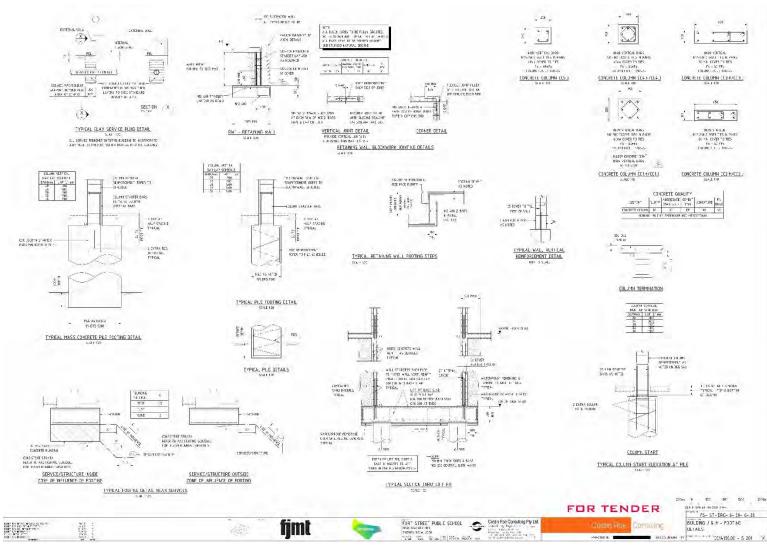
Details of piles and columns and section of lift pit in Building J. (Source: Lendlease, 2021)
